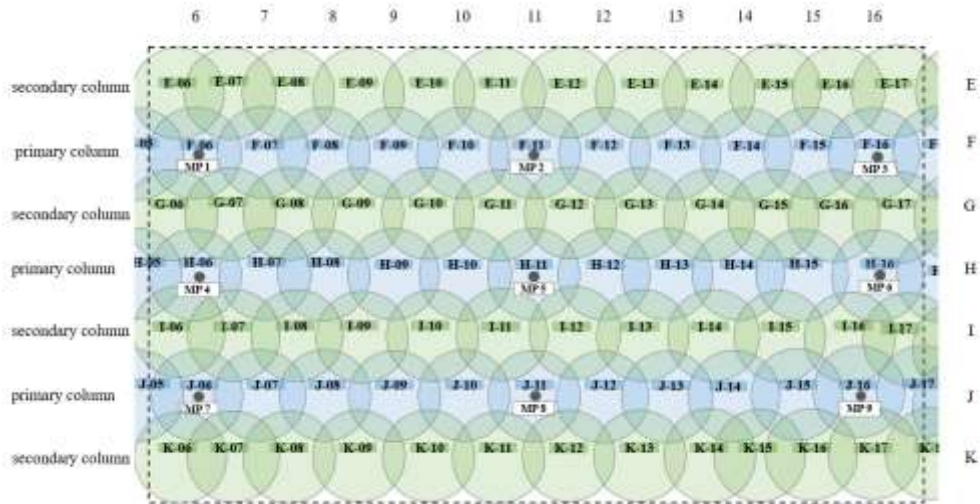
Systematic location of acceleration sensors in a bottom seal
